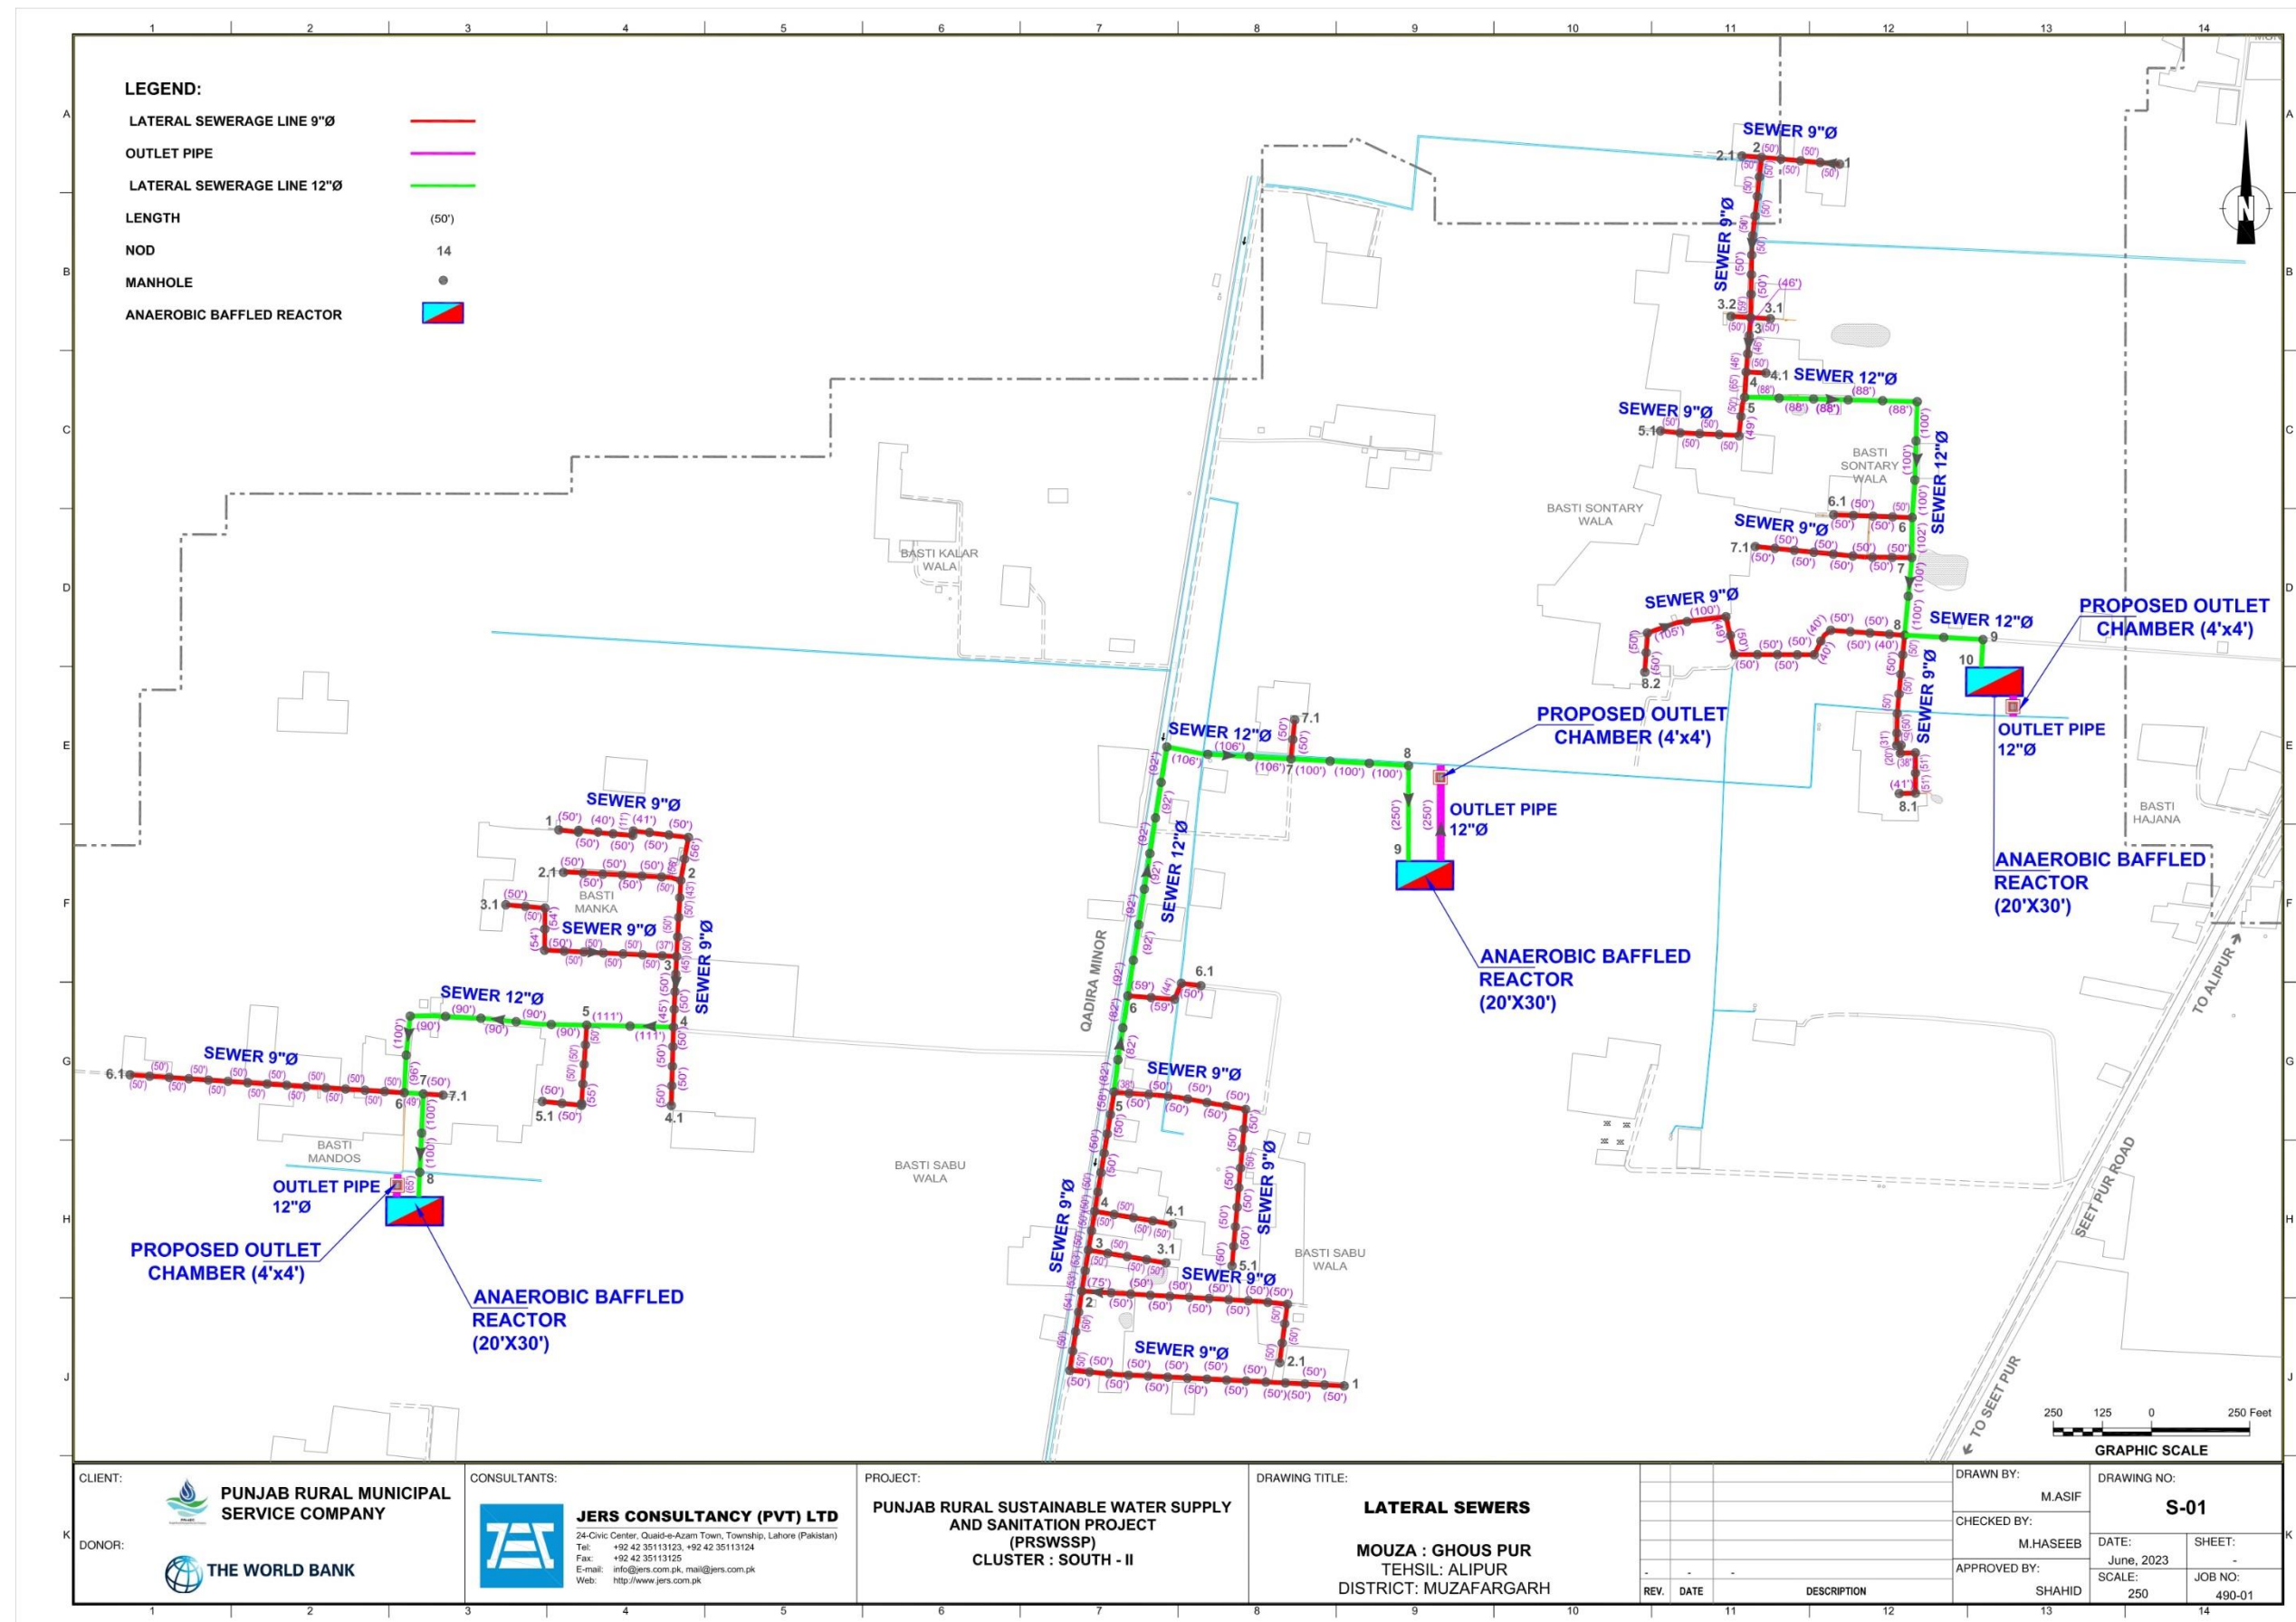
Proposed Sewerage System – Ghaus Pur
